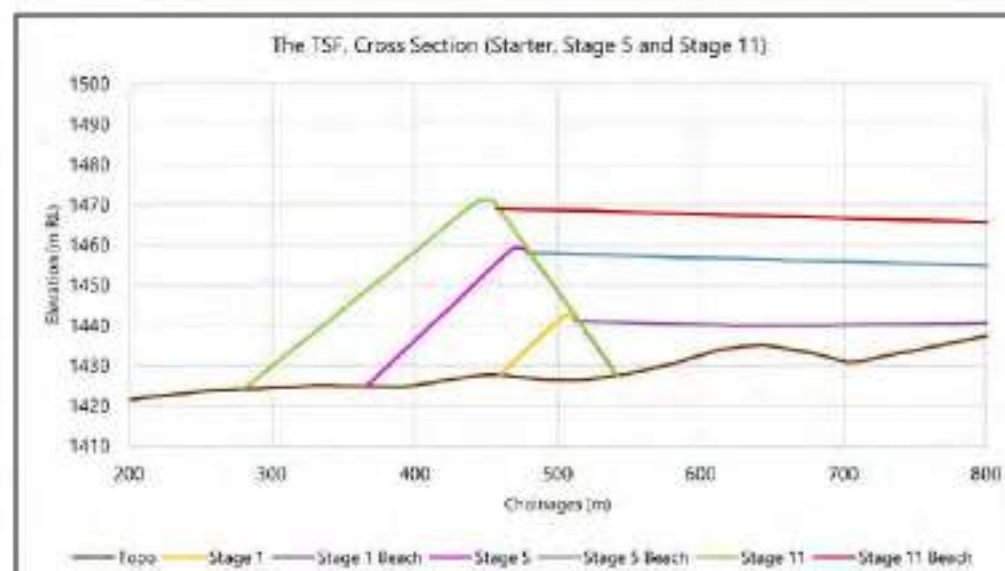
TSF cross section of embankment, illustrating Starter, Stage 5 and Stage 11
